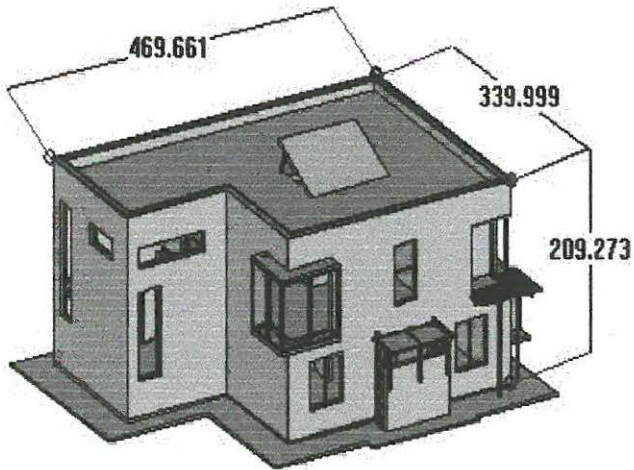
Dimension drawing of prototype (1:1) Fig. 7.33 Prototype on laser cutter (scale 1:1)
